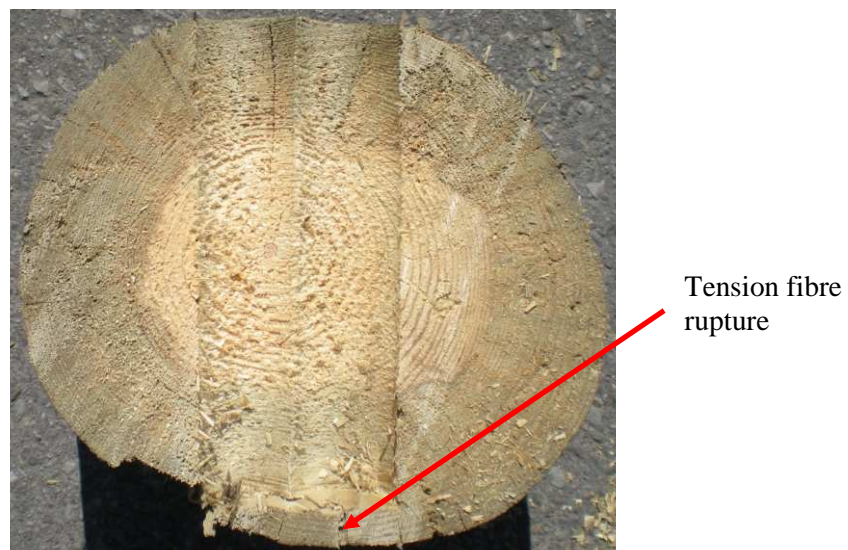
Cross-section of new pole specimen with compression nesting damage (45-2-1).
